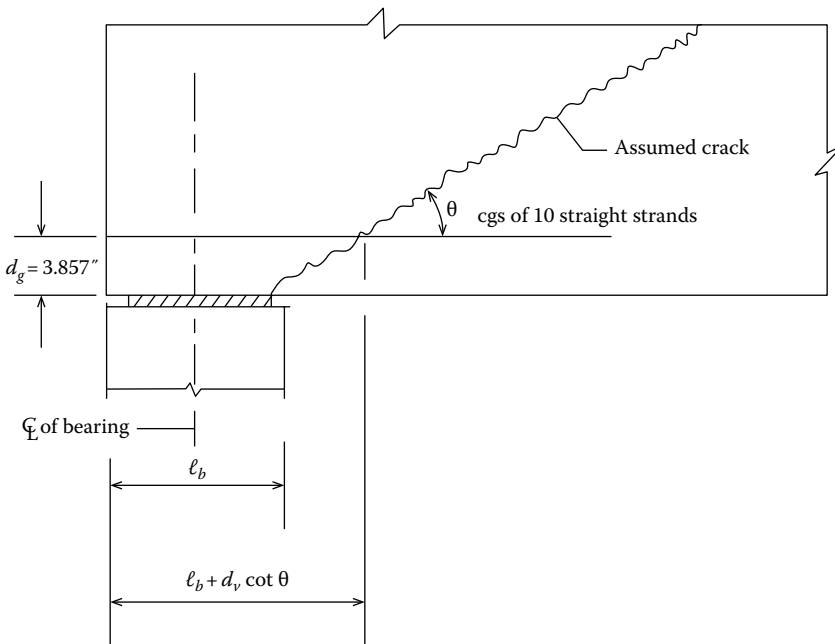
Location of the failure crack at the ends of the girder.
